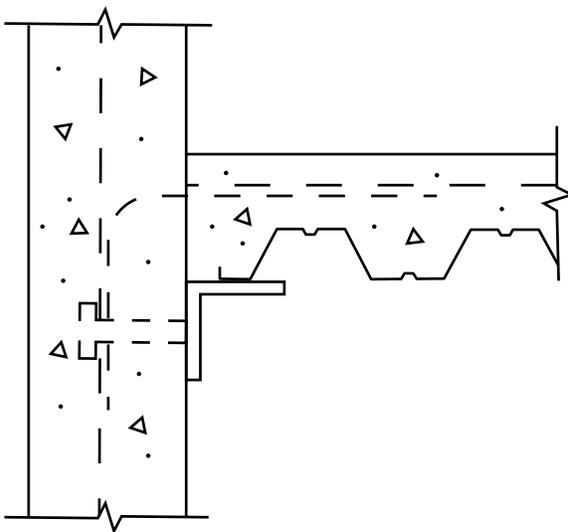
CONCRETE OR CMU WALL LEGER DECK PARALLEL
